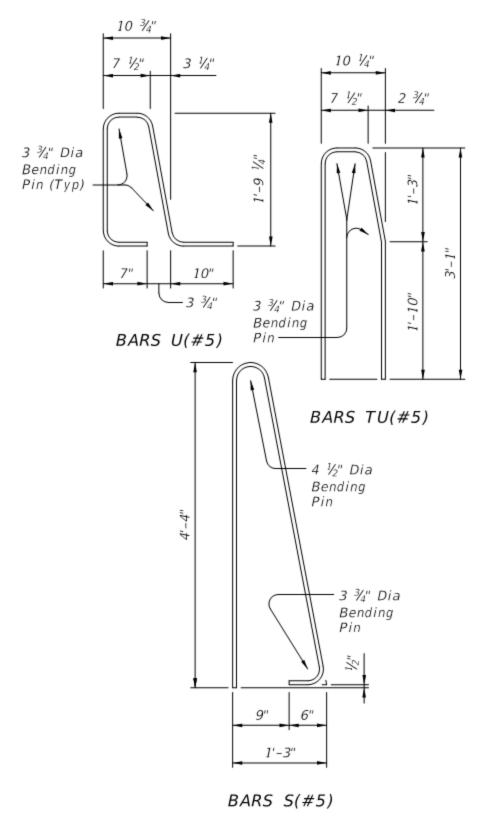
Details of Stirrups Used in Barrier and Foundation Designs.
